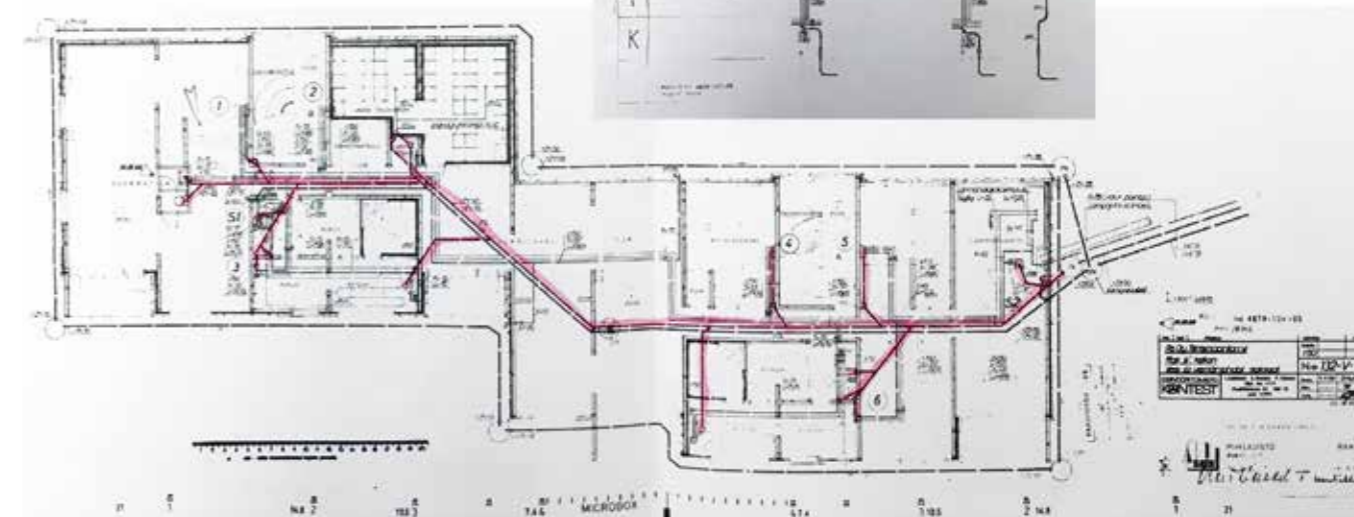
Inventory plans for the drainage system of a 7-storey residential building in Helsinki
